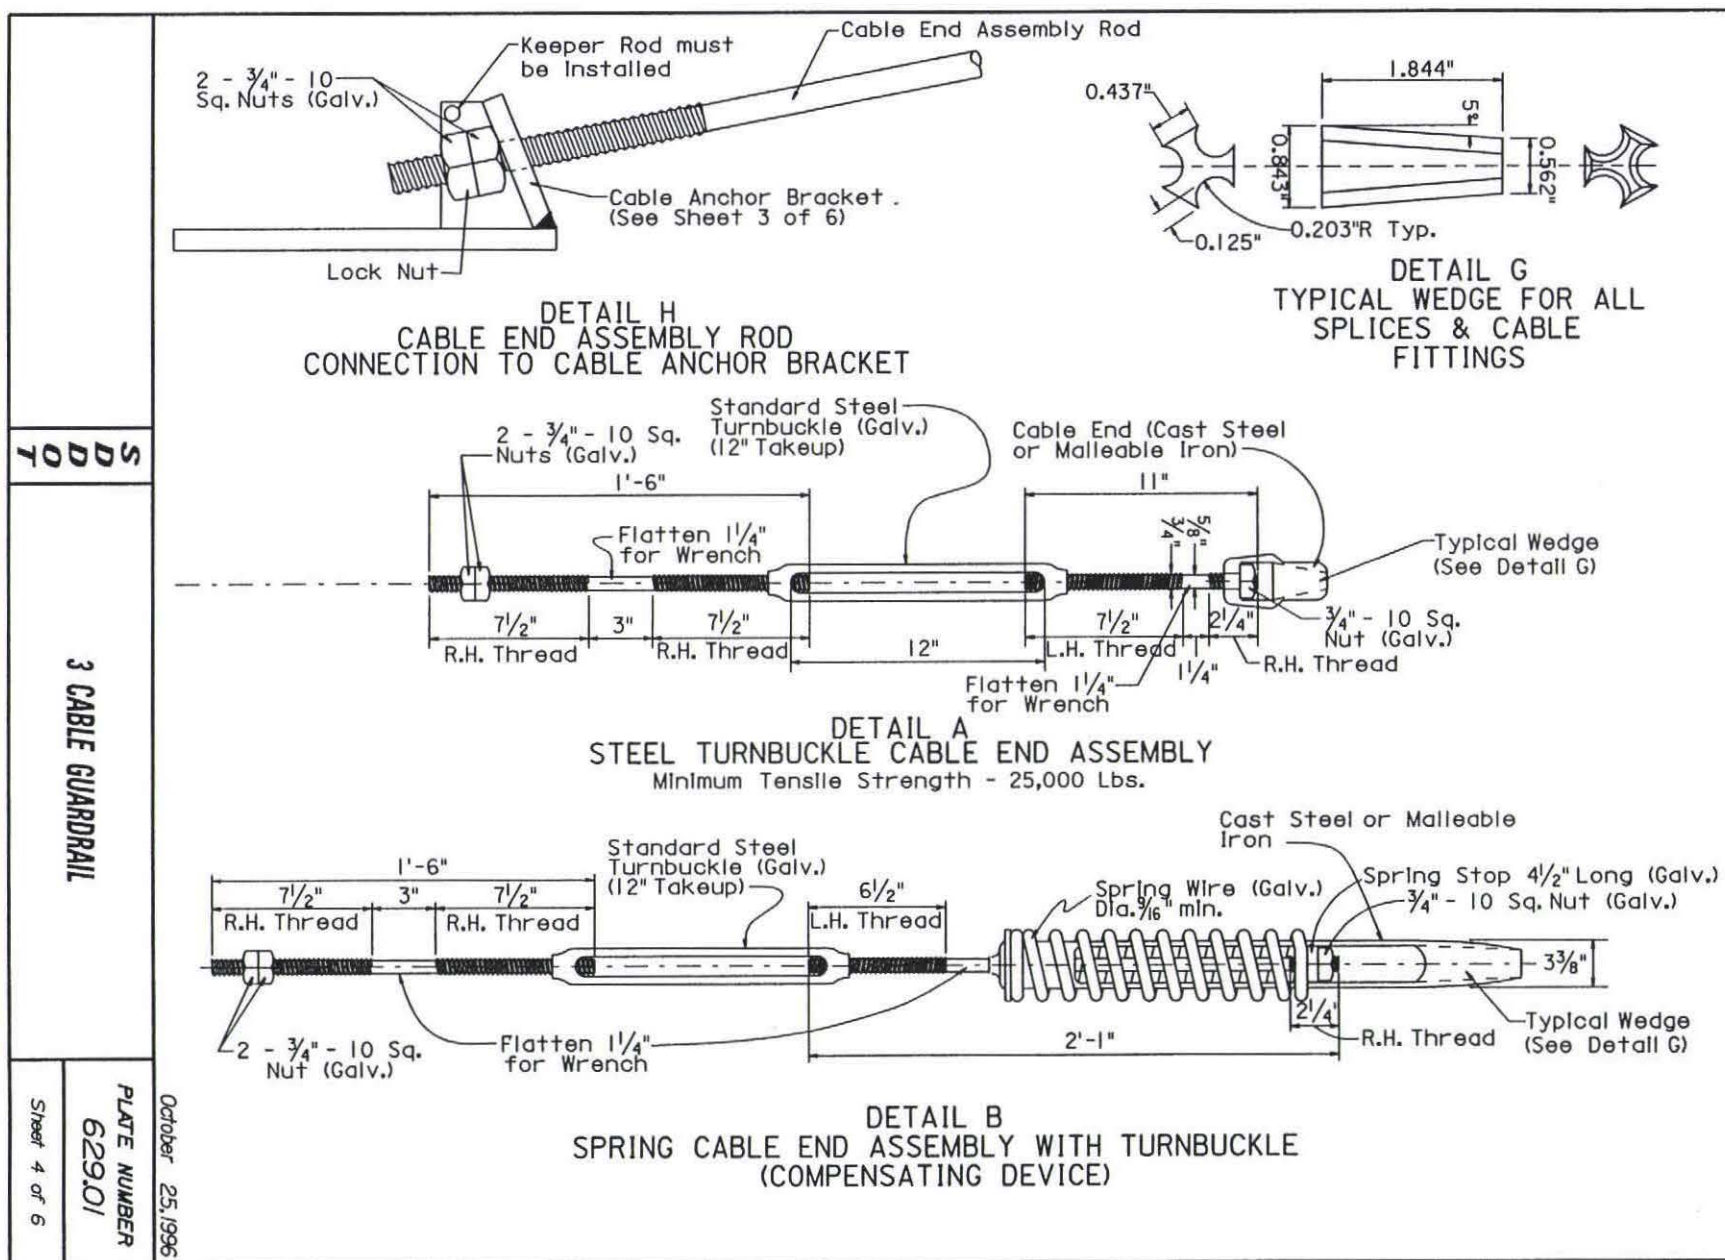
Cable Guardrail to W-Beam Transition Design Details (Continued)
